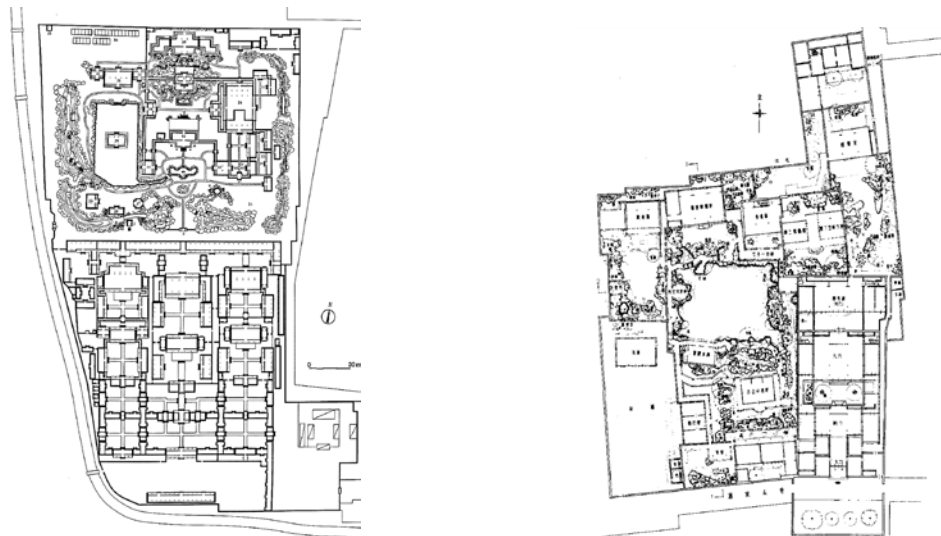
1 Comparison of the Architectural Layout of Gongwangfu Garden (Left) in the North and the Wangshi Garden (Right) in the South
